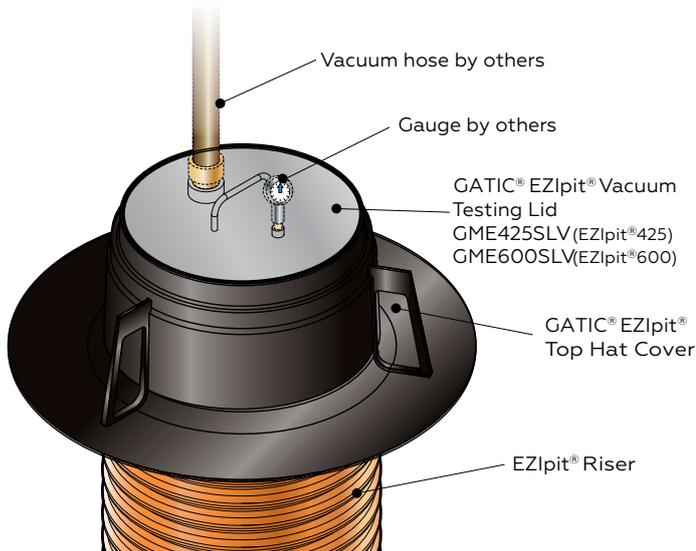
Vacuum Testing using DN425 or 600 GATIC® EZIpit® Lid with 'Top Hat' Frame.
